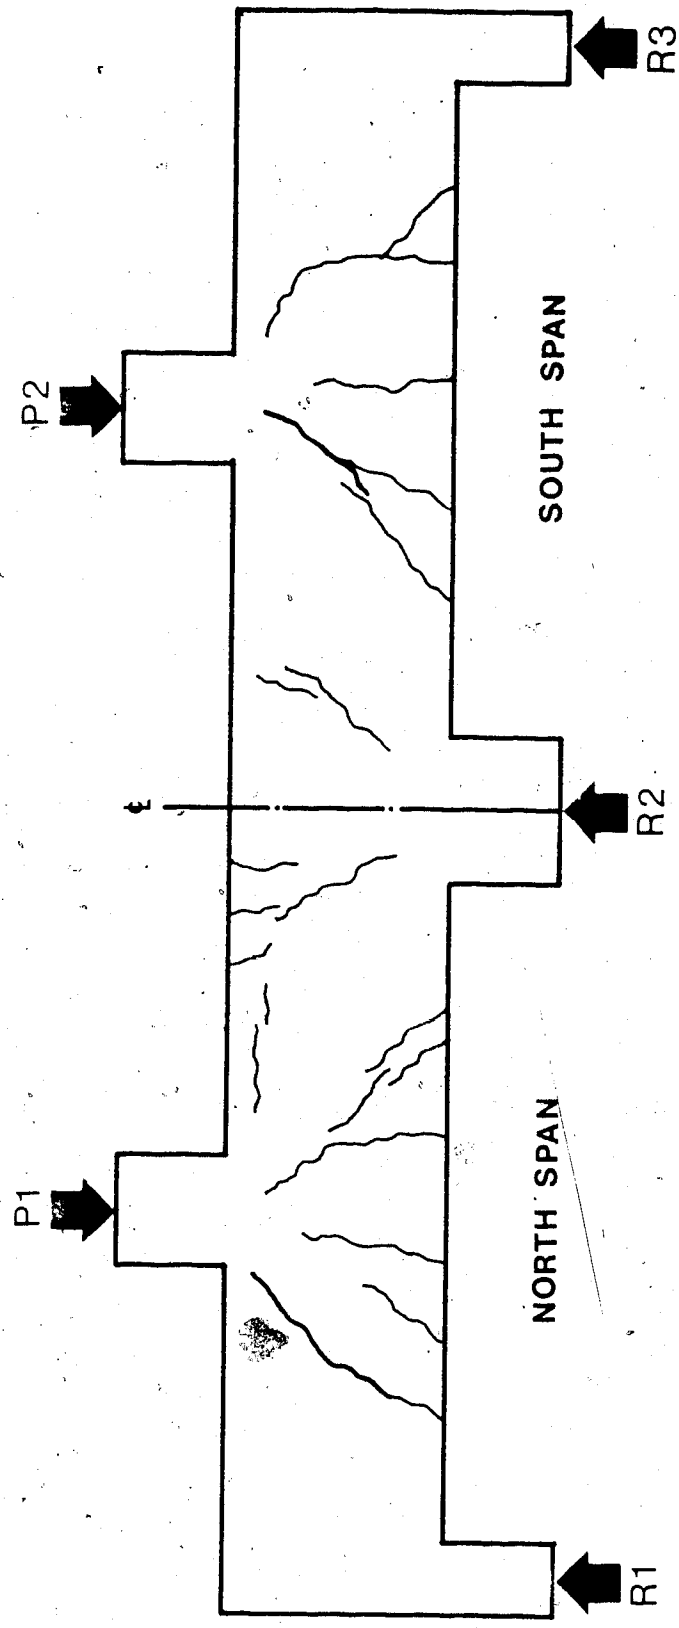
First Inclined Cracking Pattern of Beam No. 2
